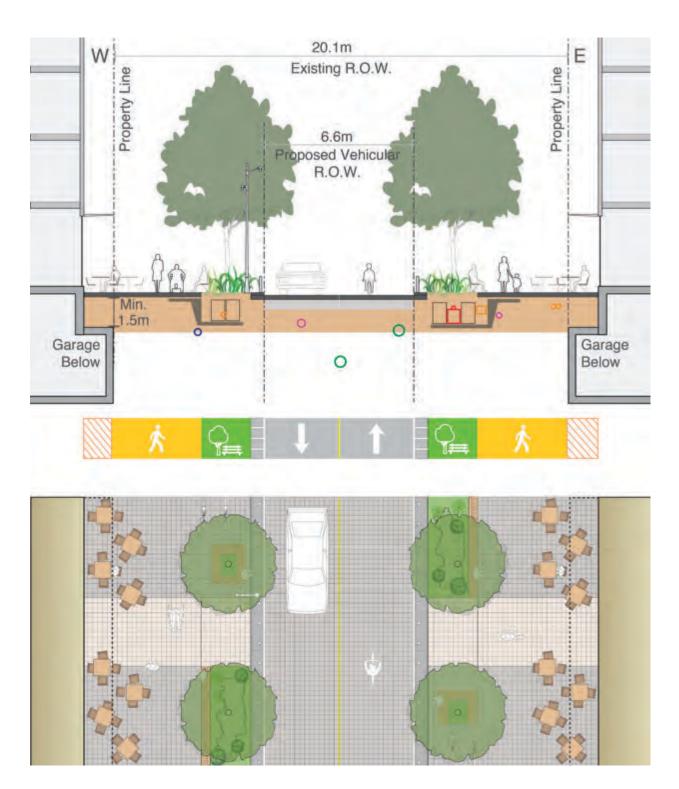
Section and Plan of Redpath Revisited - Recommended Final Condition from Roehampton Avenue to Eglinton Avenue
